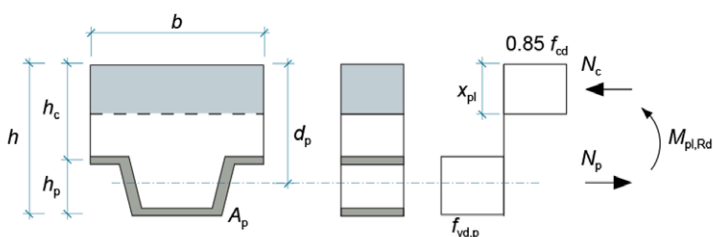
Stress blocks and lever arms for a composite slab cross-section (no bars in troughs so the only tensile reinforcement is the decking). Notation as per BS EN 1994-1-1
